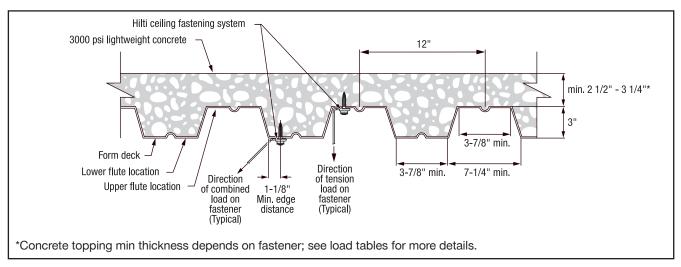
Hilti ceiling fastening system location in 3-in.-deep composite floor deck, normal deck profile orientation
